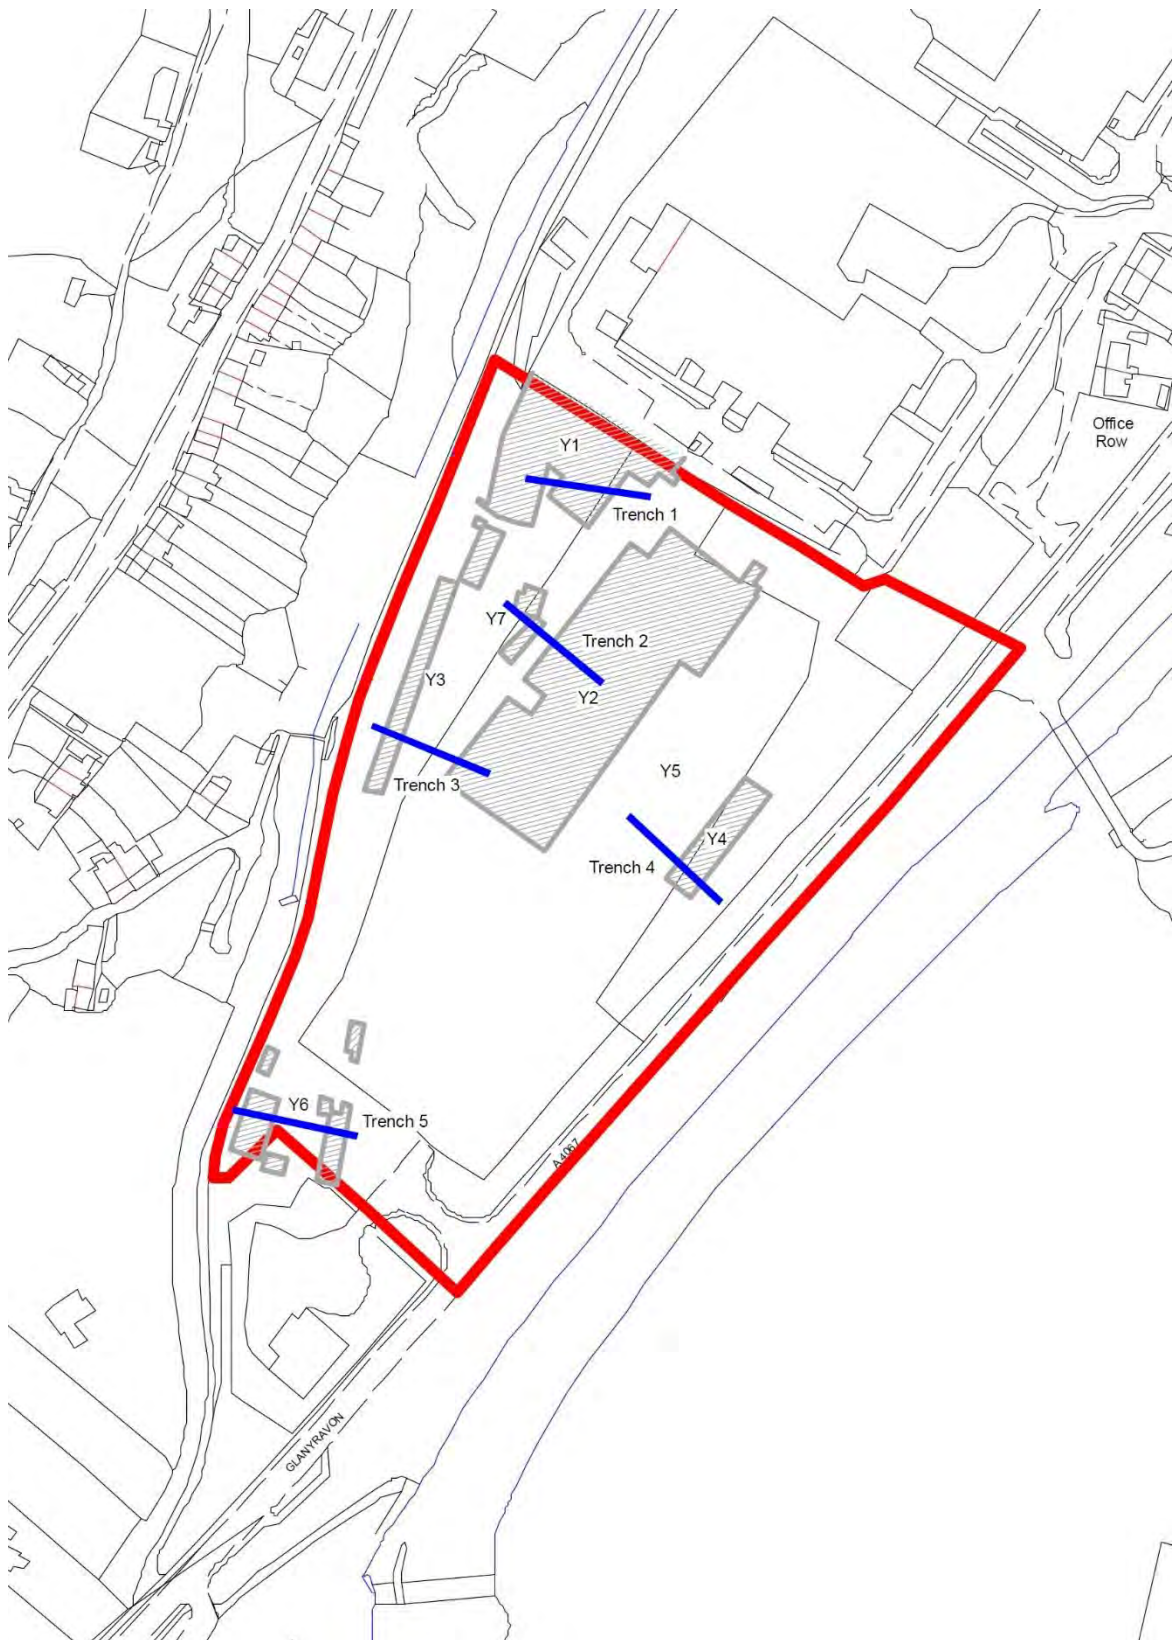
Proposed Trench Location Plan, with former structures indicated as hatched grey blocks, labelled as Site features Y1 to Y7
